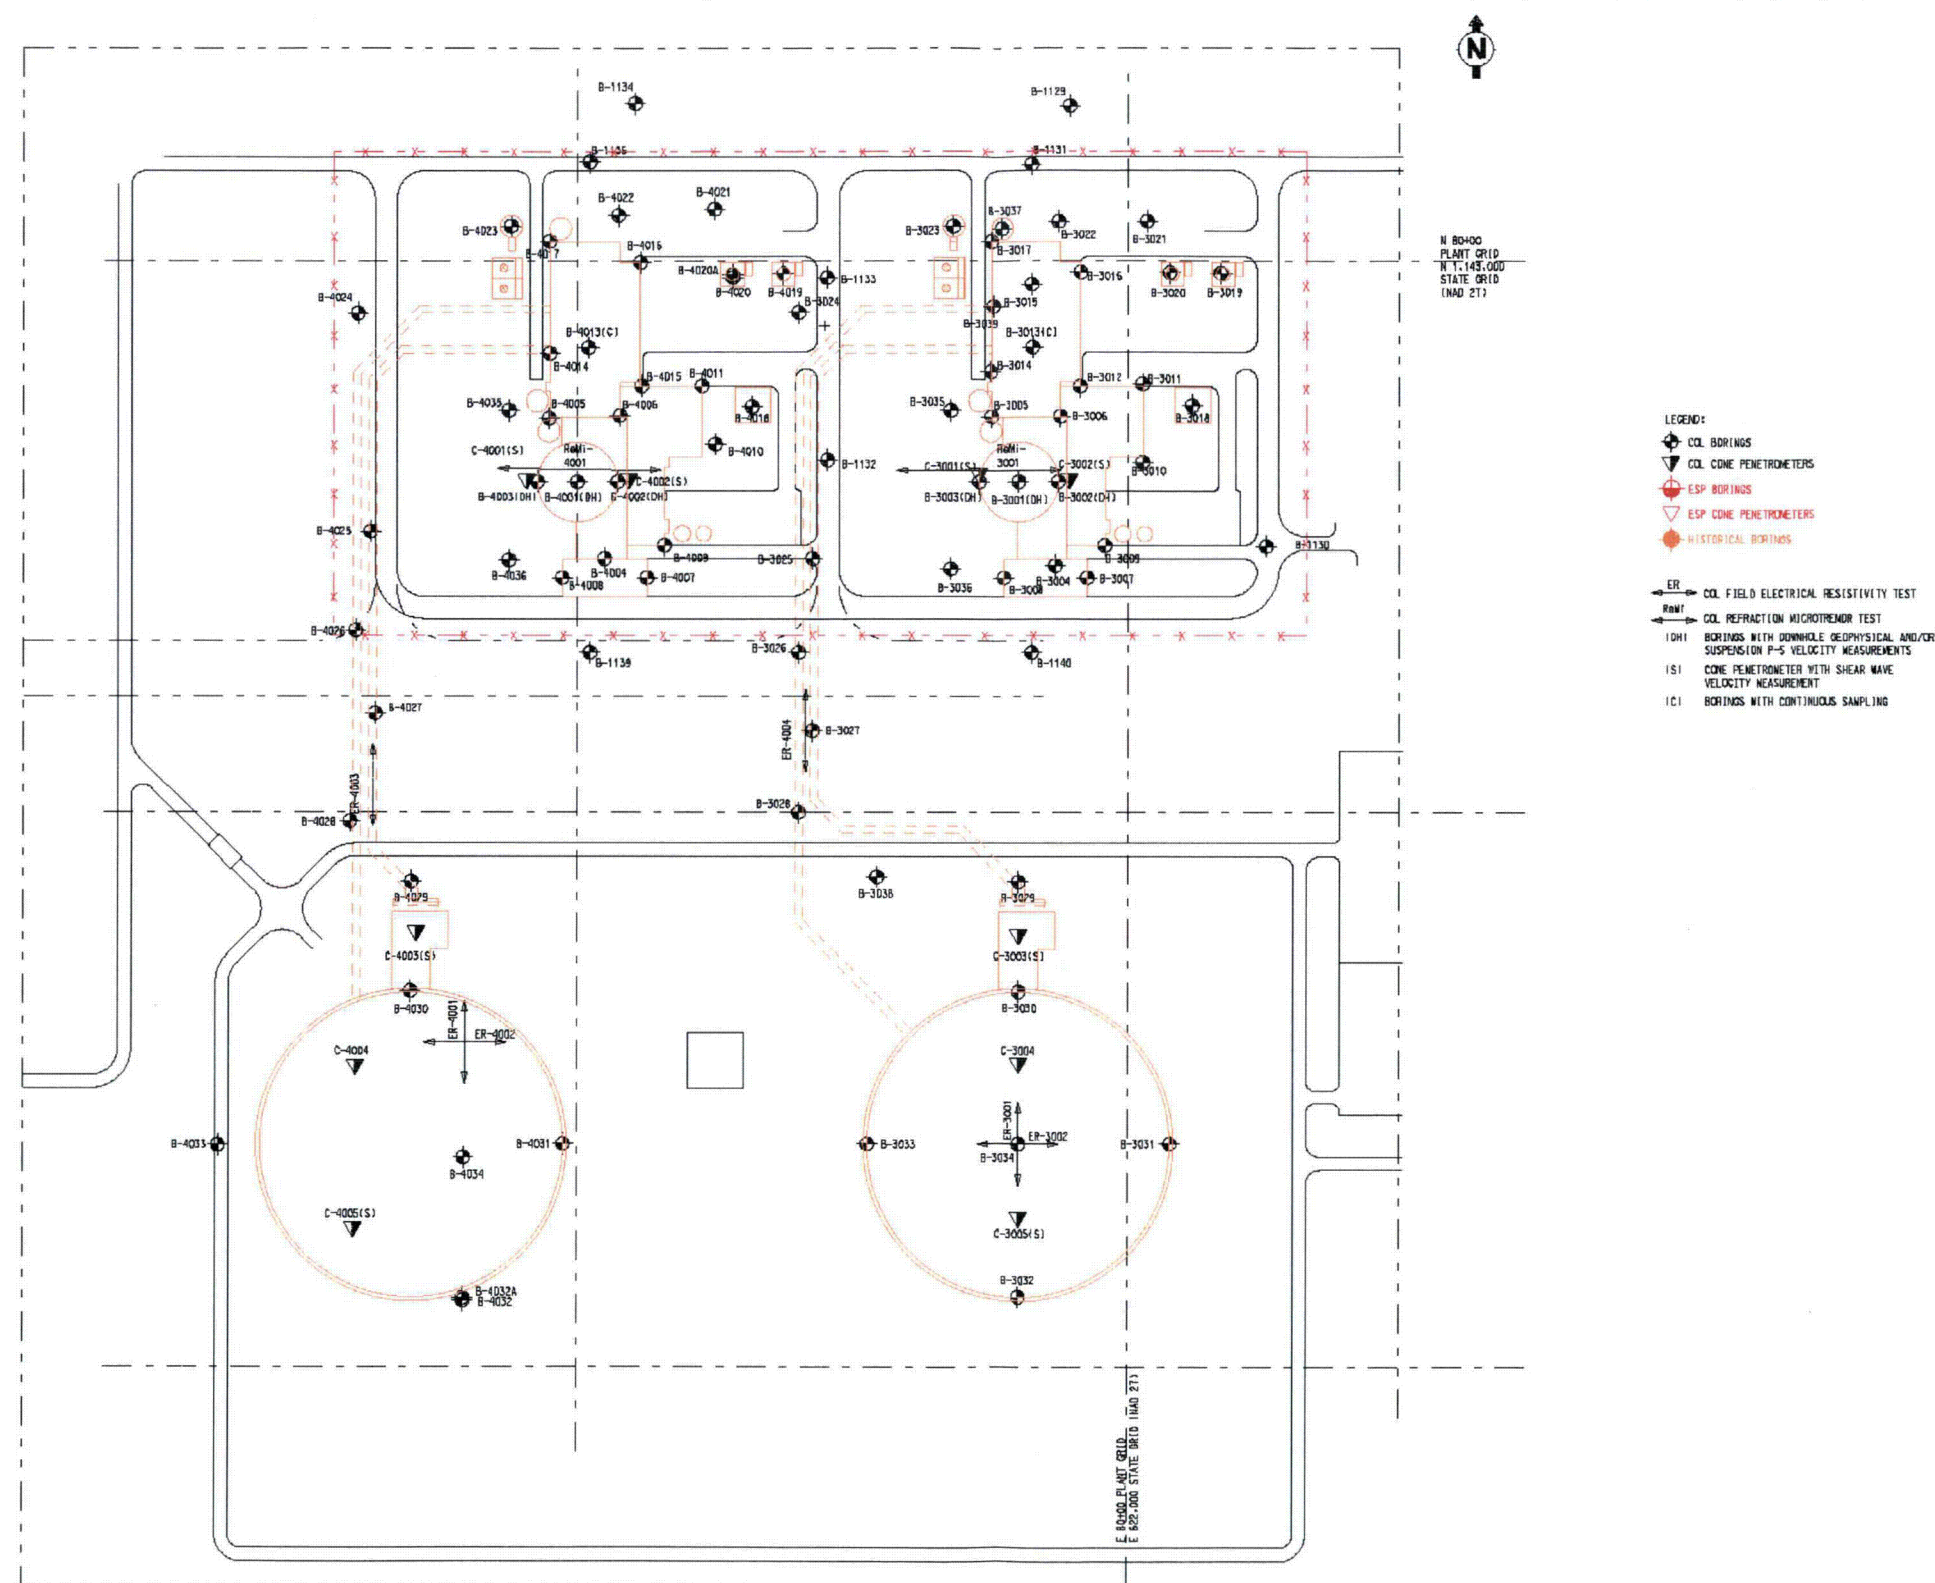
COL Power Block—Cooling Tower Boring Location Plan
